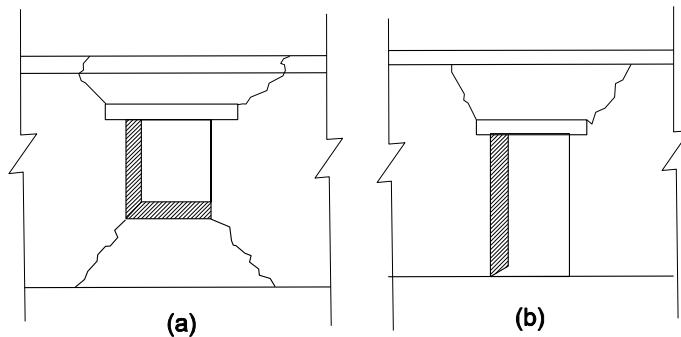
Illustration of cracks originating at stress concentration locations: (a) cracks appearing first at upper corners of window opening followed by lower corner cracks; and (b) cracks at upper corners of door opening. (source: Manual of The Getty Conservation Institute)
